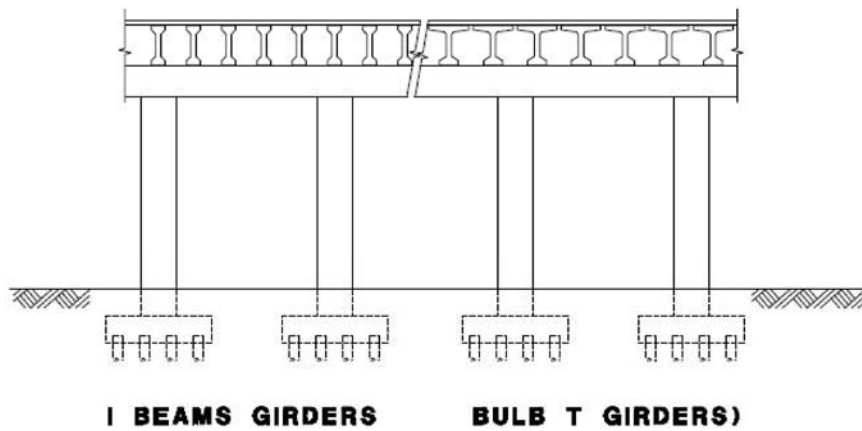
Typical Section for PC/PS I or Bulb T Girder Structure (2008)
